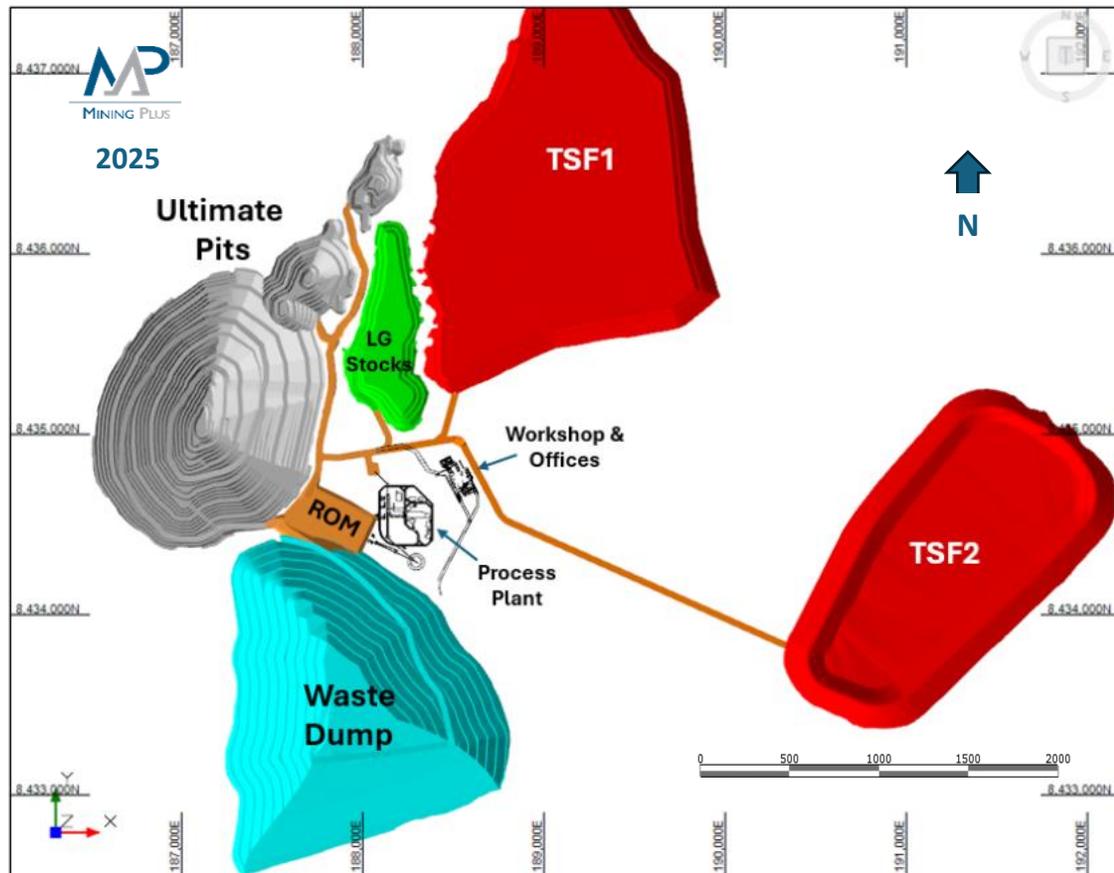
Mt Todd Final Pit Design and Mine Layout Pit Geotechnical Analysis
